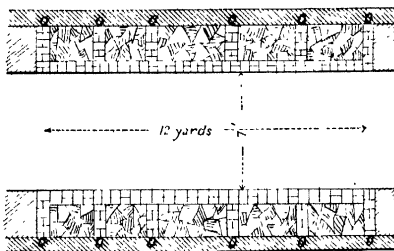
BRICK-ARCH AIR-CROSSING, IN PLAN.
